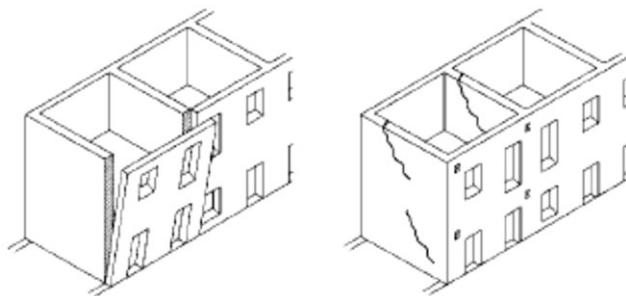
Basic damage modes of a masonry building (Decanini et al., 2004).
